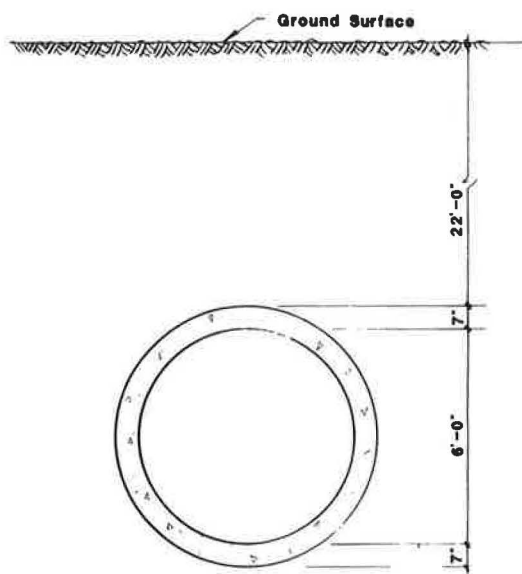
Pipe geometry for PIPECAR sample problem.
